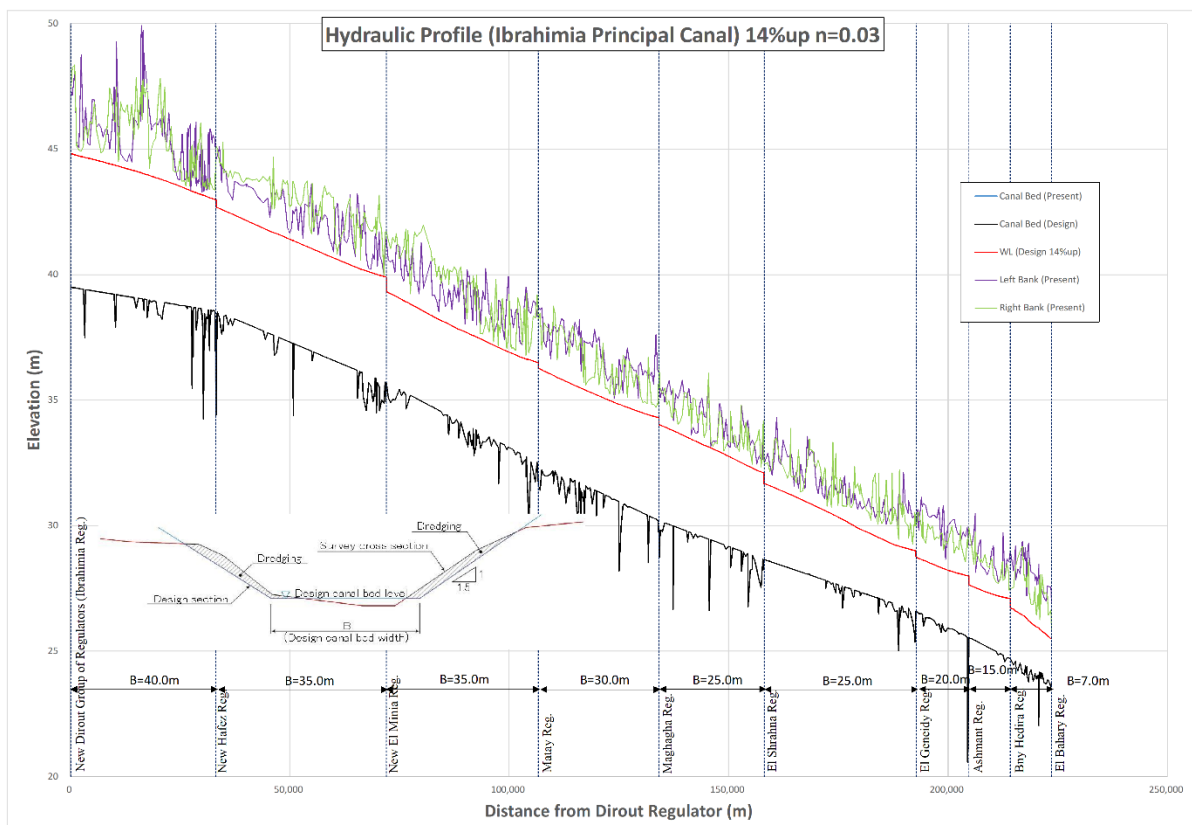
Hydraulic Longitudinal Profile of Ibrahimia Principal Canal (Maintenance Plan: 14% up)
